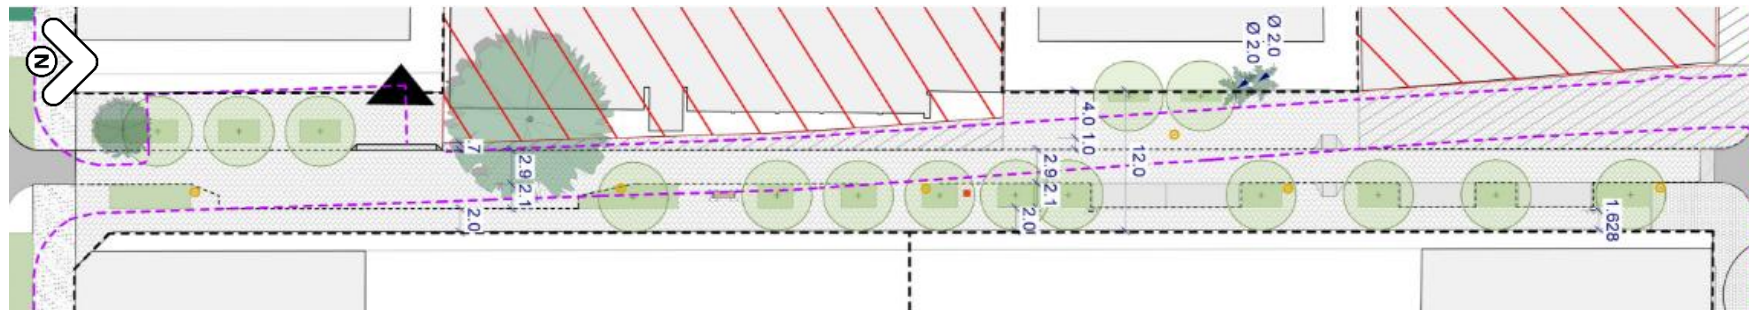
Street Plan - Cooper Street North (Aspect Studios)
